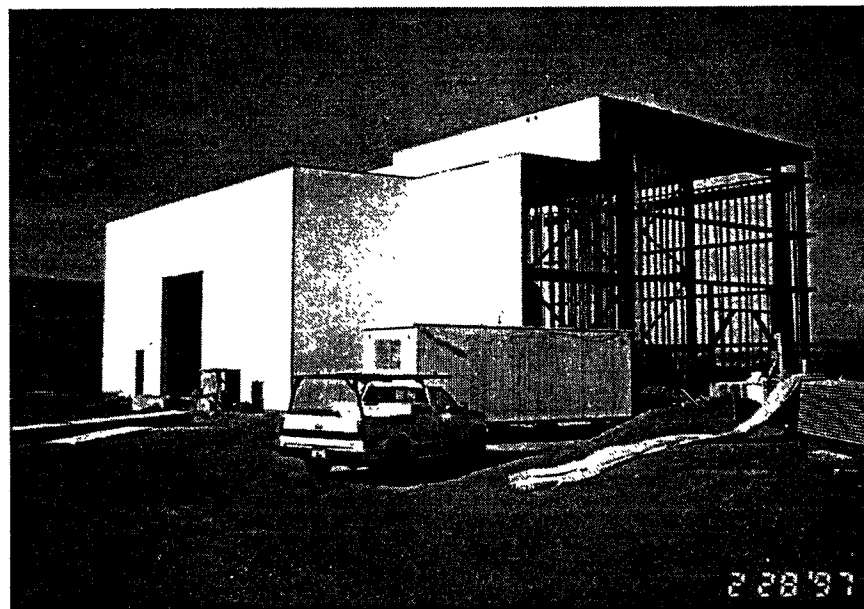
View of End Station on Southwest Arm at the Hanford Site.
